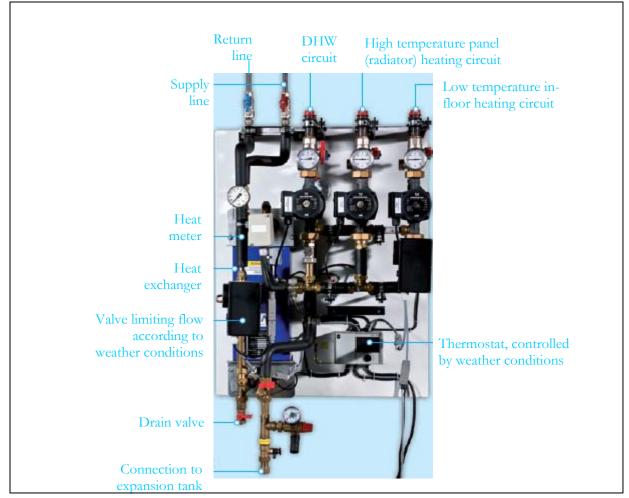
Prefabricated building substation transferring heat from a district heating pipeline into a building. An experienced HVAC contractor can install this wall mounted substation in less than 4 hours. Source: MVV Energie AG <u>www.mvv.de</u>
